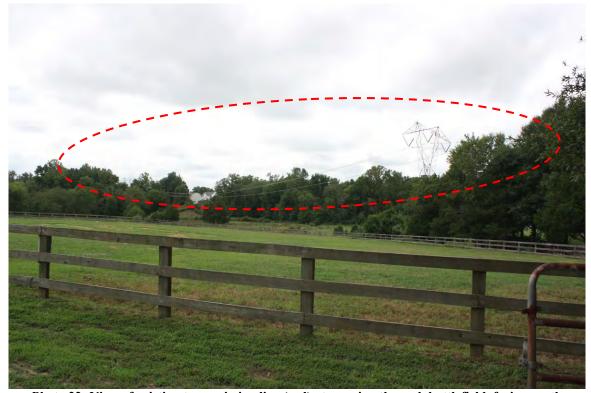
View of existing transmission line (red) at crossing through battlefield, facing south
